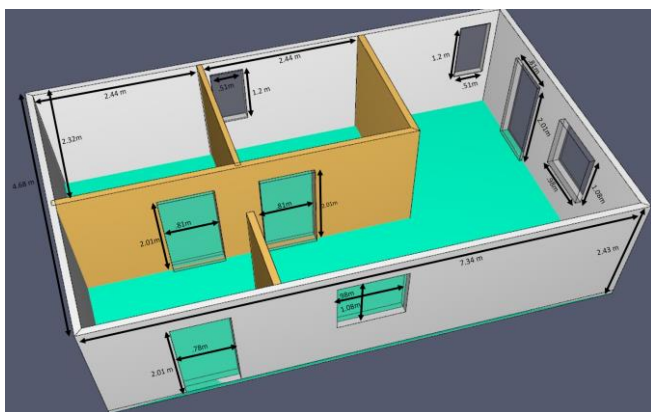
The test room is prepared following a similar layout of the dwellings to be constructed in Karmøy ROP project. The whole apartment has a floor area of 35 m<sup>2</sup>.
